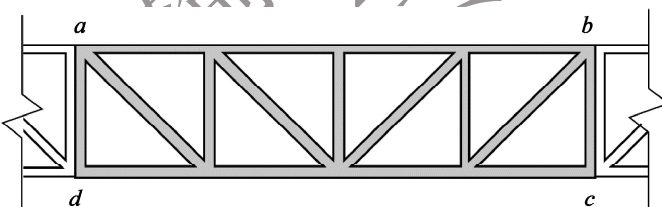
Schematic for the calculation of wind loads on a truss structure
